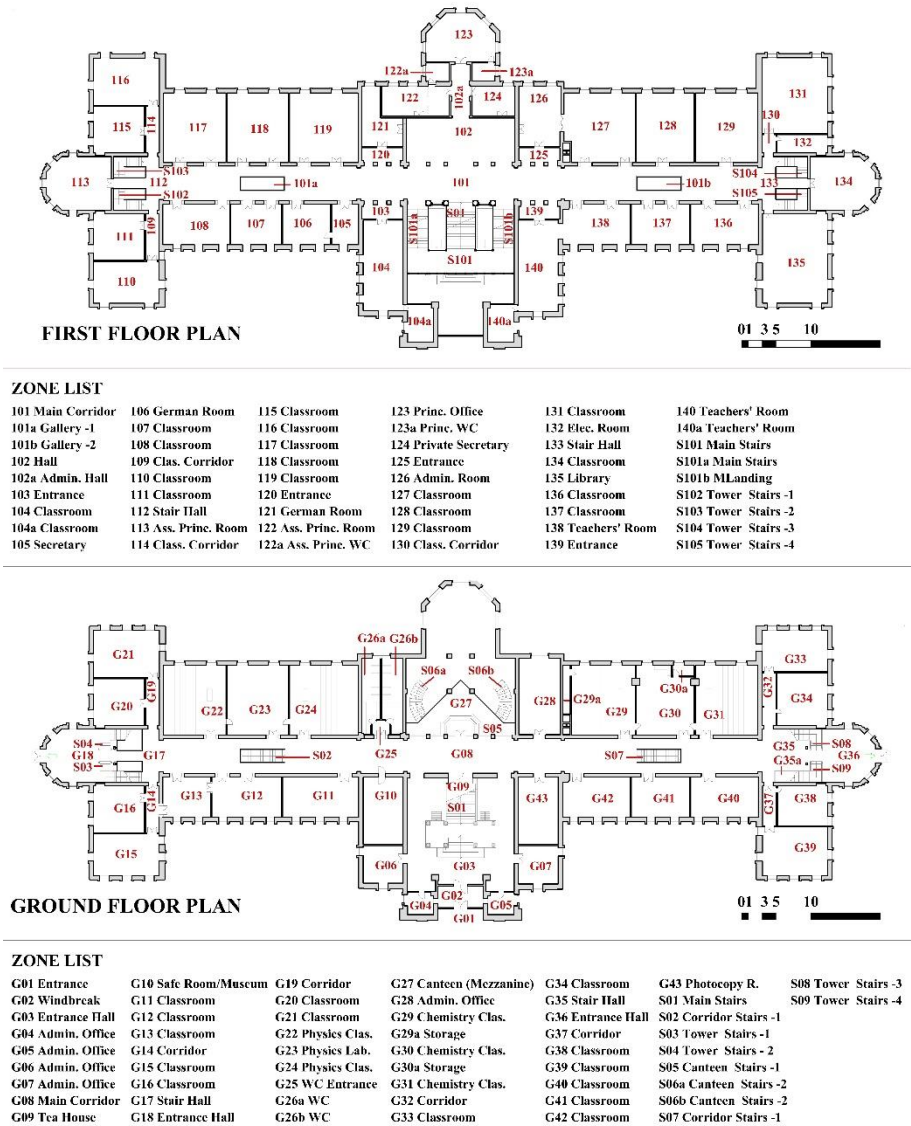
Plan drawings and zone lists, ground-floor and first-floor.
